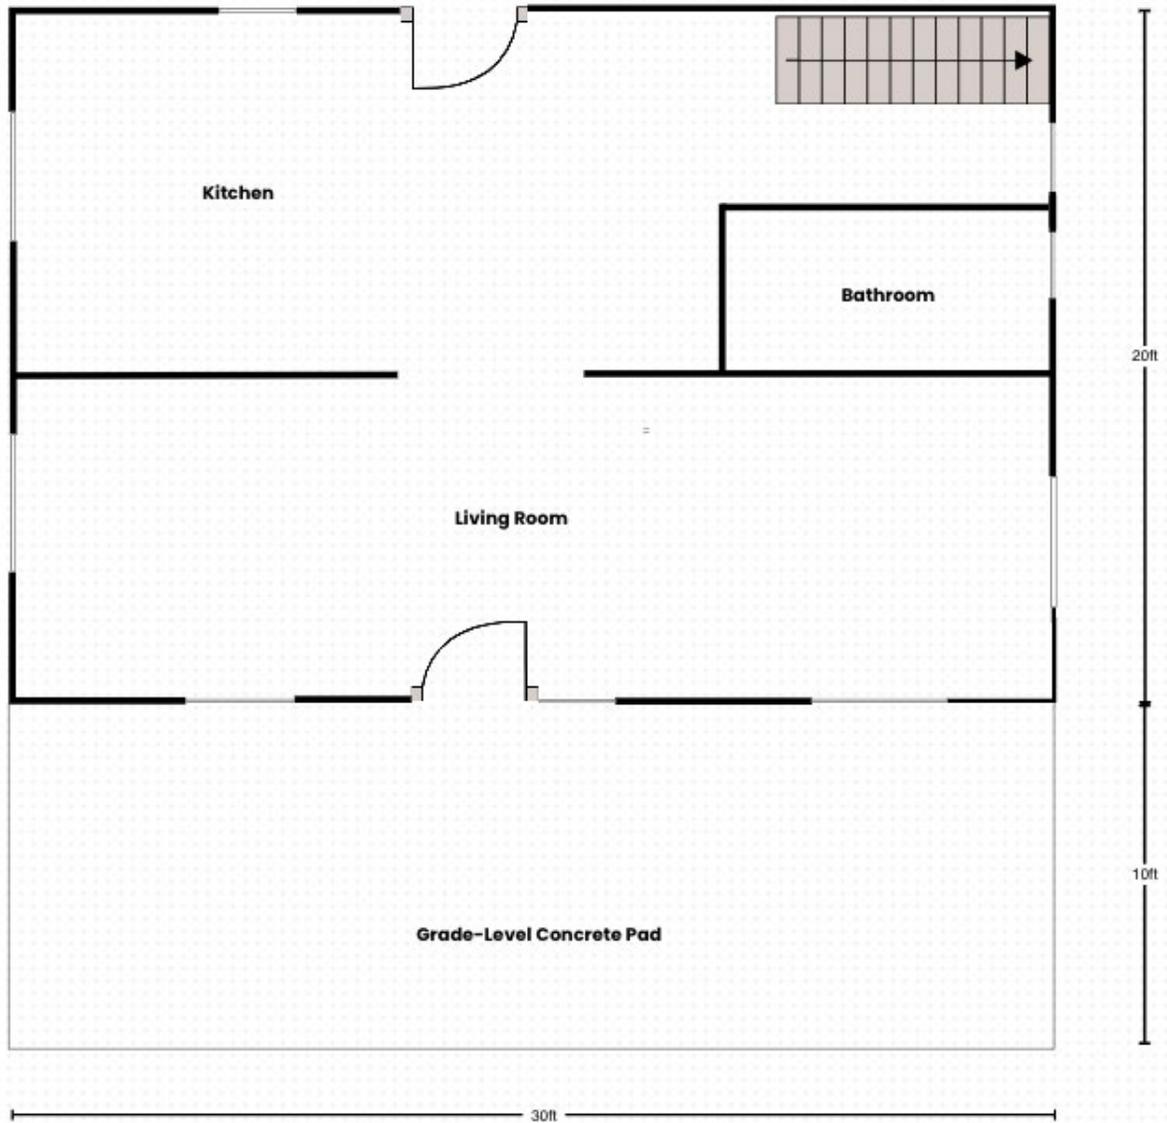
Single-Story Farmhouse Floor Plan, First Floor (Schiffman).⁵³
